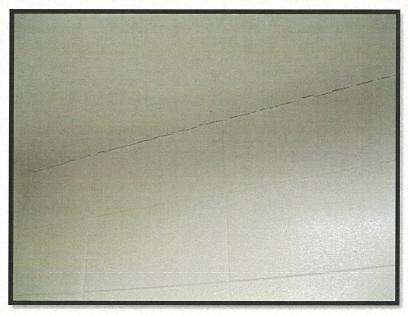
Illustration of identified lead-based paint on cinder block walls and lead-based paint of drywall ceiling.
